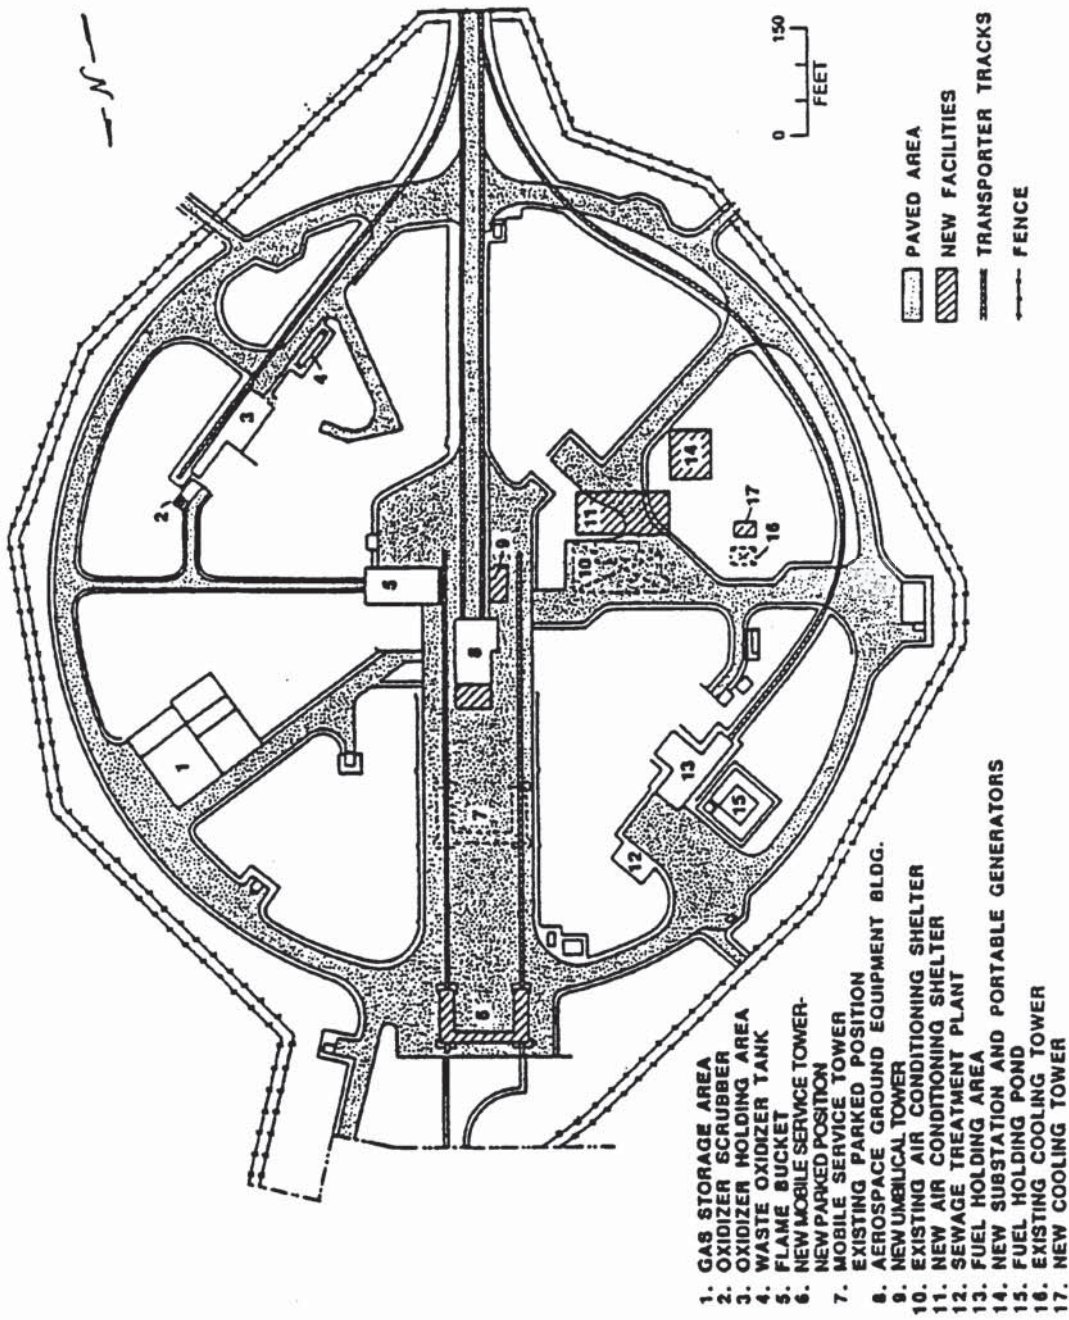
Existing and Proposed Layout of Launch Complex 40 at Cape Canaveral Air Force Station
